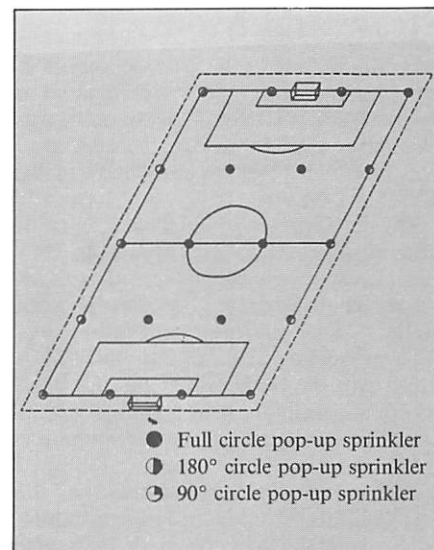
Typical football/hockey/rugby pitch pop-up irrigation sprinkler head layout.
